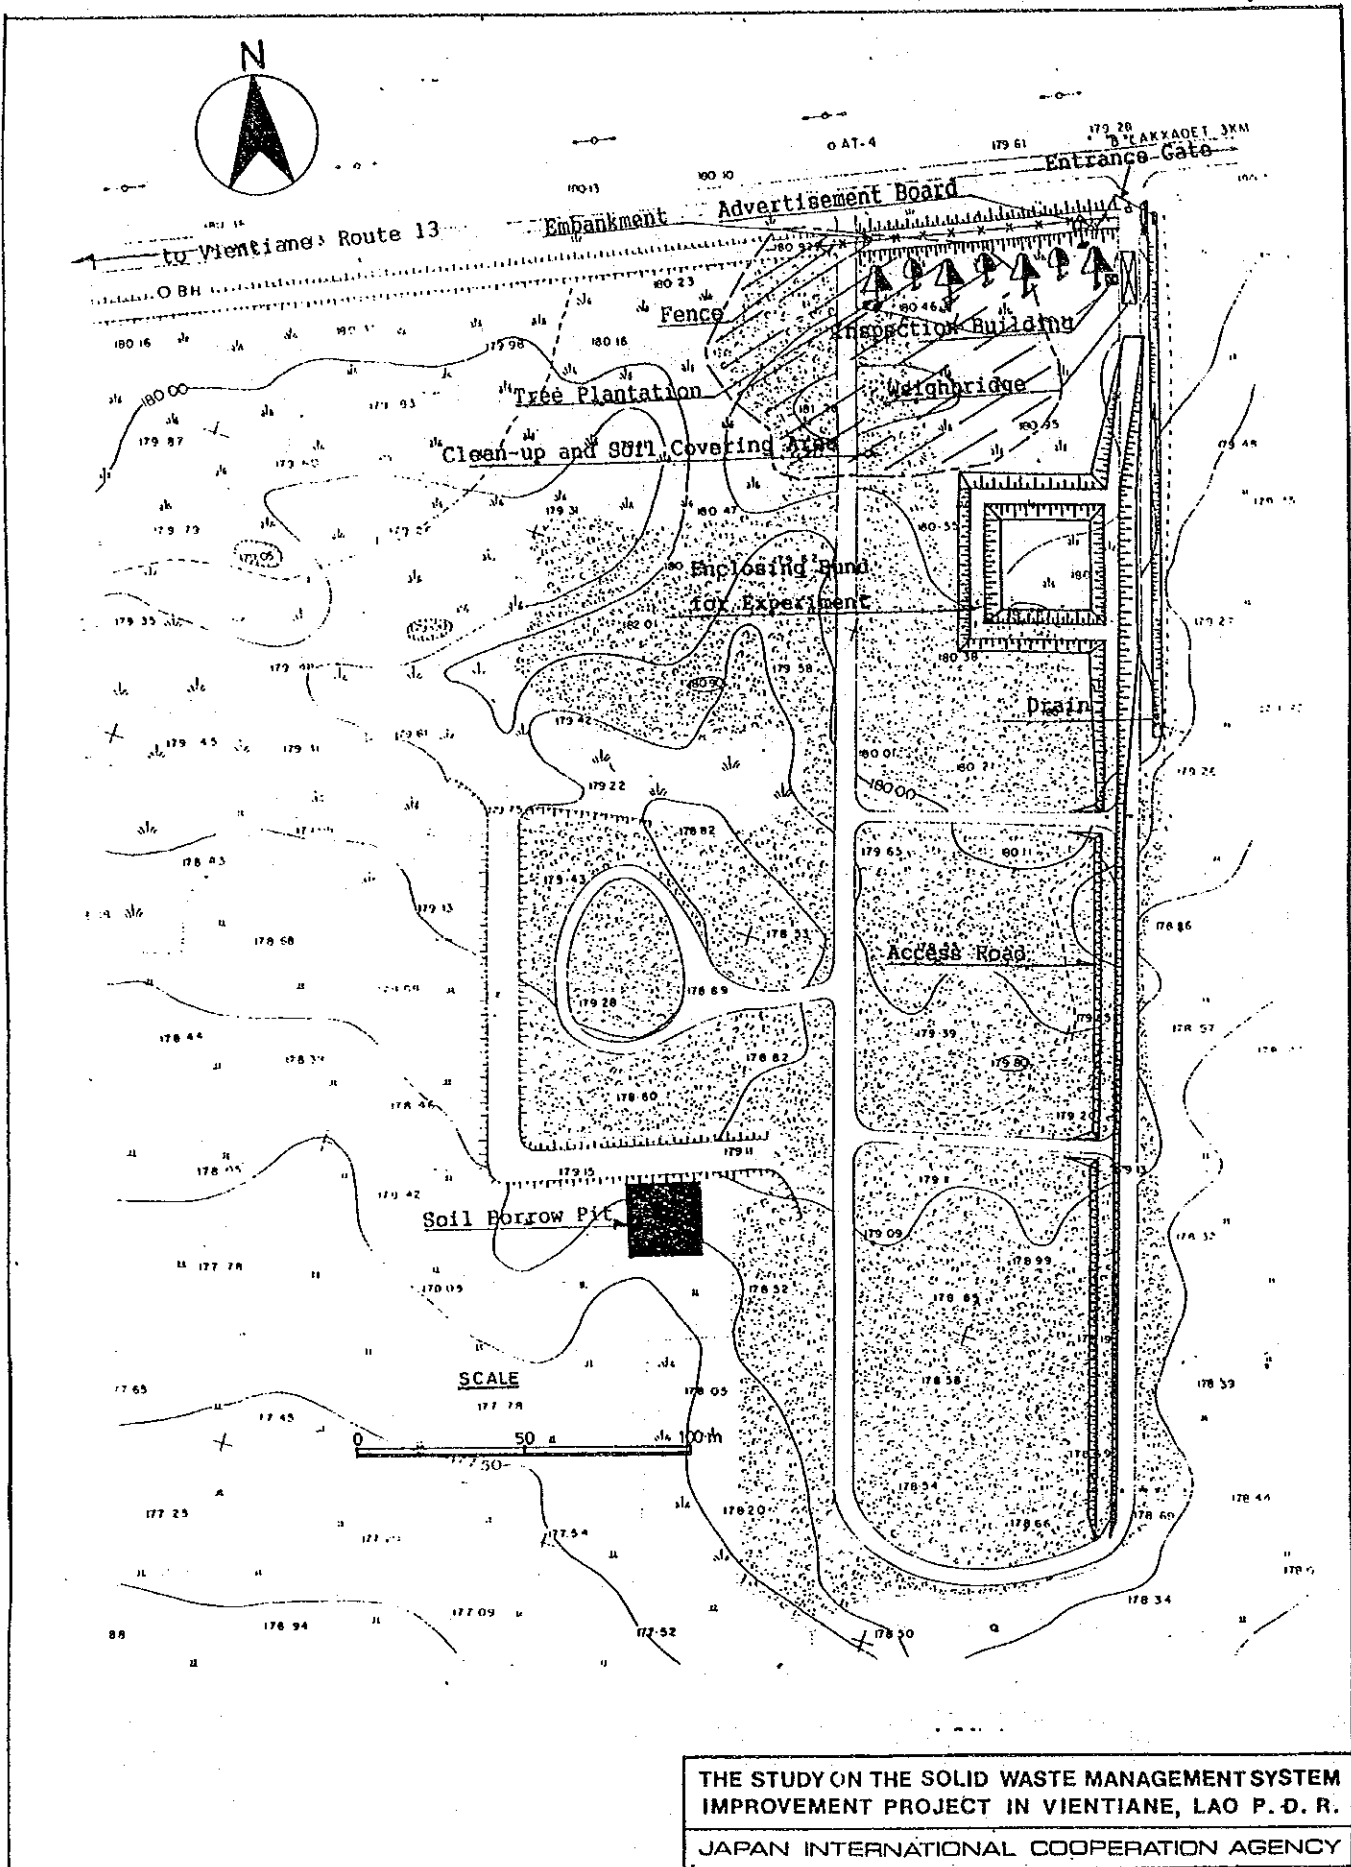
Site Development Plan for the Experiment on Sanitary Landfill
